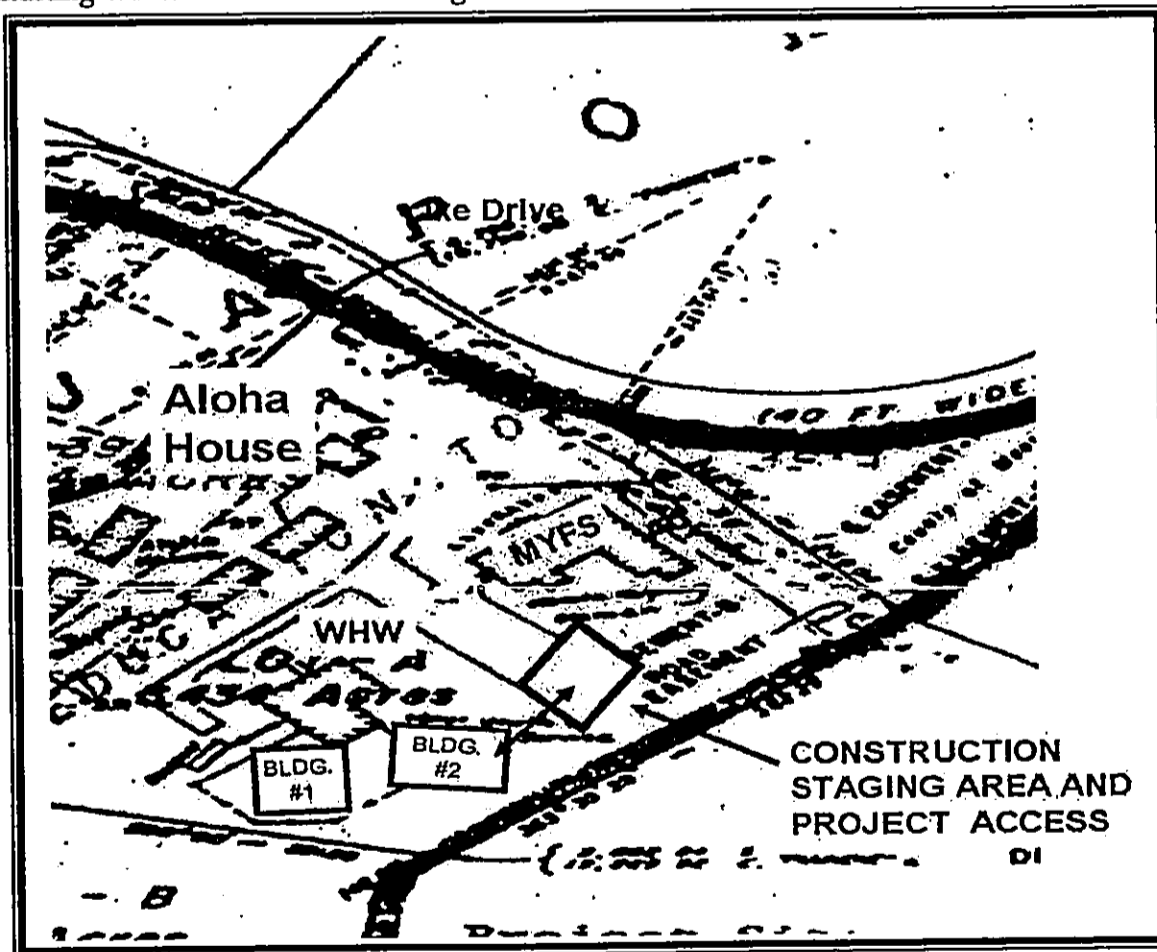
FIGURE III.c – Location of proposed facilities and Project Staging area with access route.
